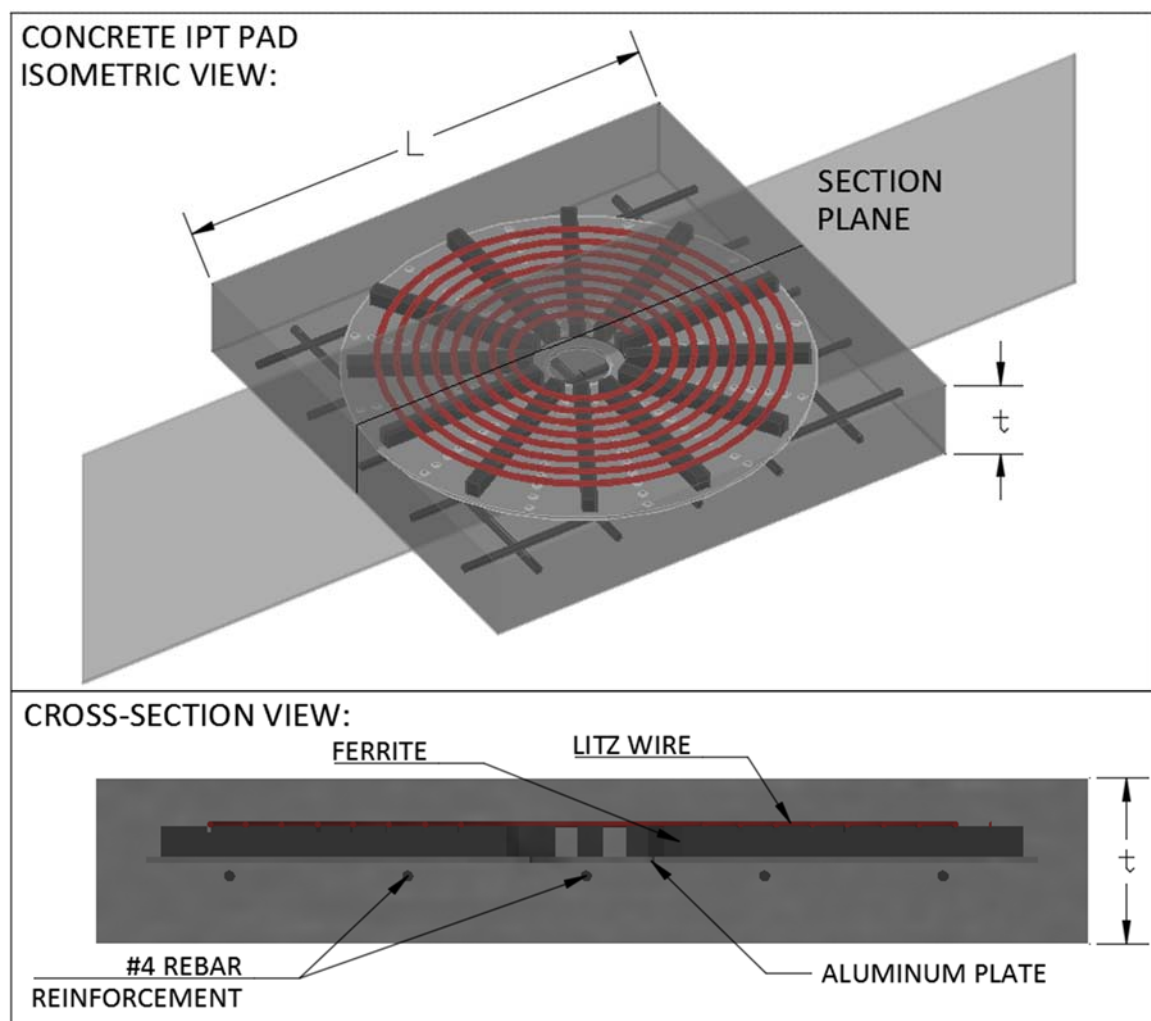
Concrete IPT pad Isometric and cross-section views
